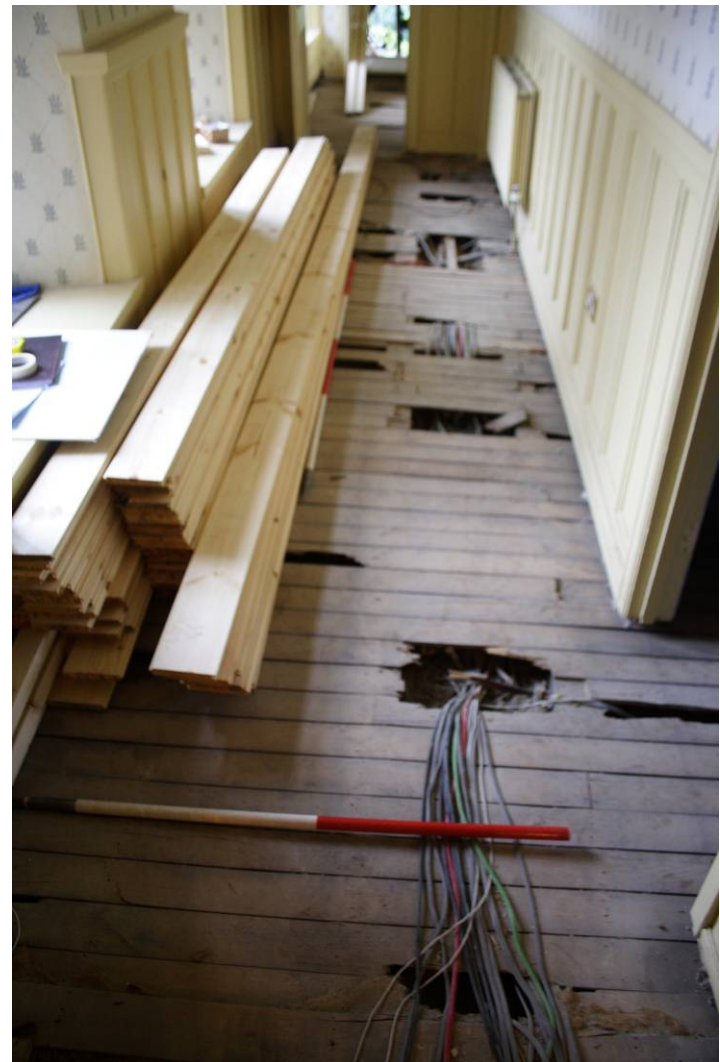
Corridor 102, viewing SW from Stair 108, with underlying wooden slats exposed
